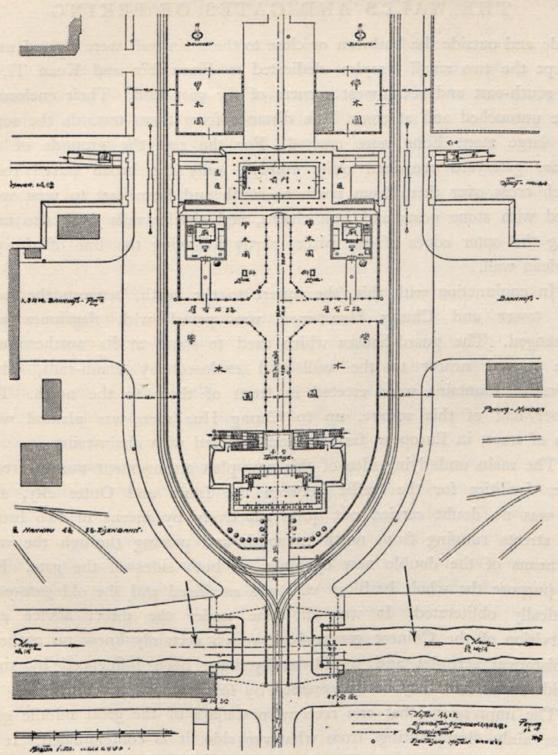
Ch'ien Men, general plan, after the reconstruction.
